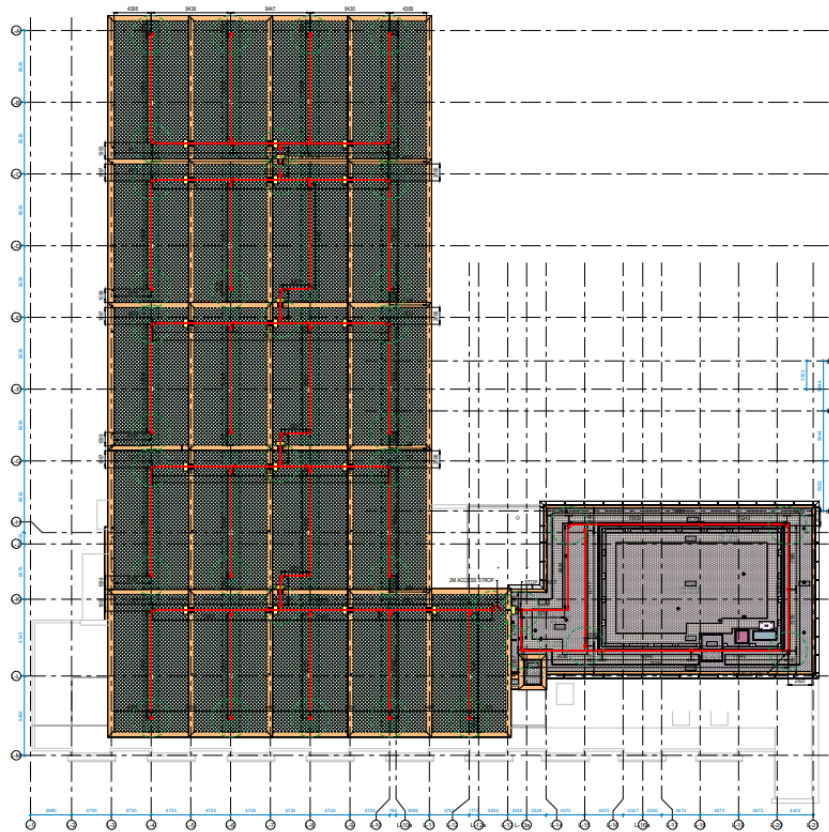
6098-KAY-ZZ-RF-DR-X-0001 Proposed Roof Mansafe Plan
